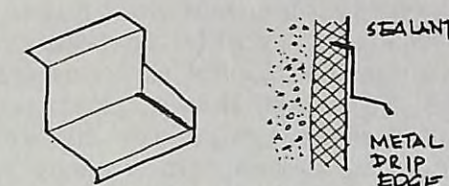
Head flashing with end dam; flashing sealant connection to ICF.
